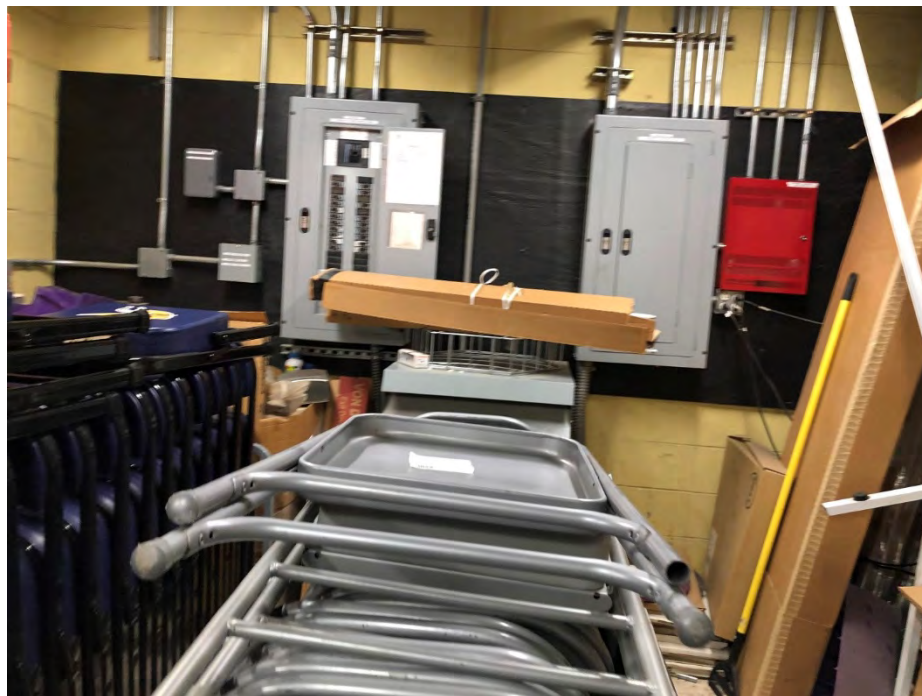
Electrical Distribution System and Fire Alarm Booster Panel for Building 2 Located in Building 2A
